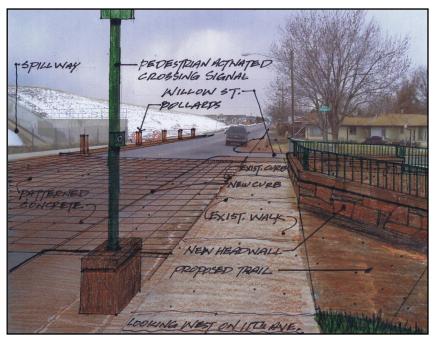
(above) - 11th Avenue, looking west from the Westerly Creek channel, towards Willow Street
